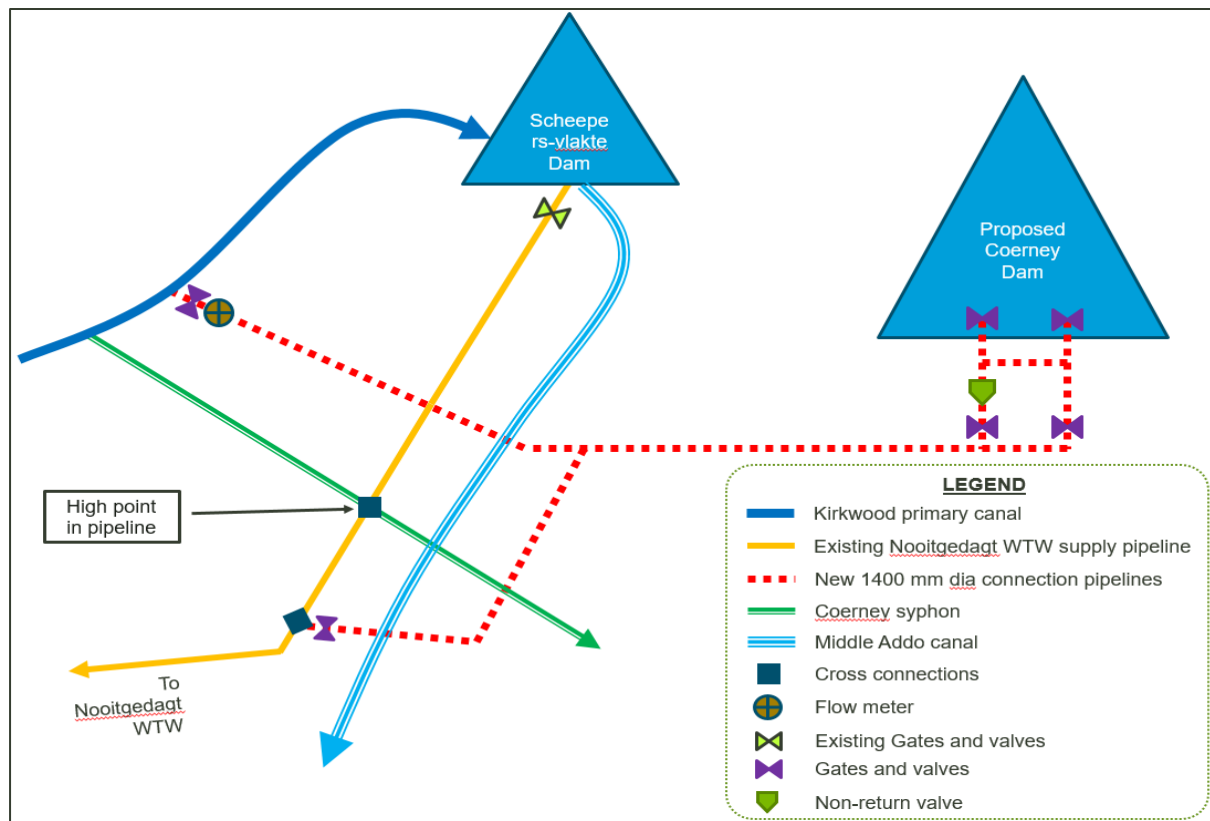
Schematic layout of the proposed new dam and connecting pipelines (DWS, 2020)
